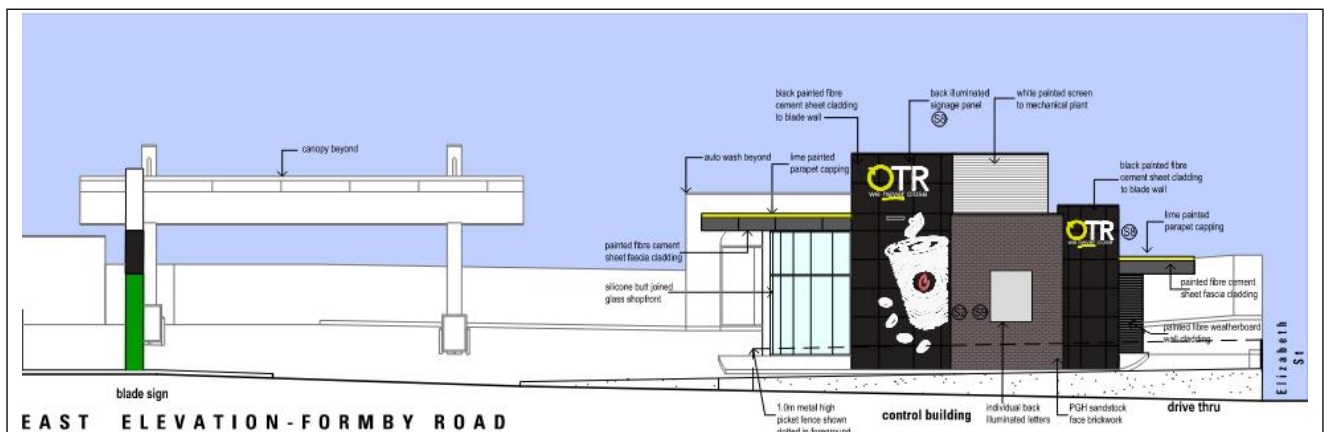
Eastern elevation from Formby Road (Source: Ratio)
